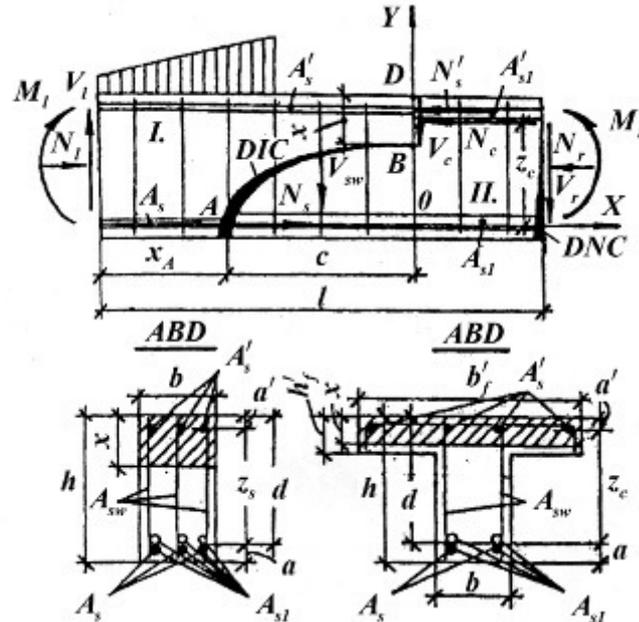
Design model of reinforced concrete element with dangerous normal DNC and inclined DIC cracks, reinforcement and forces
